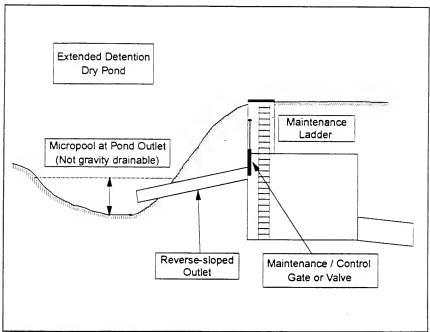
Dry Pond Reverse-sloped Outlet Pipe
